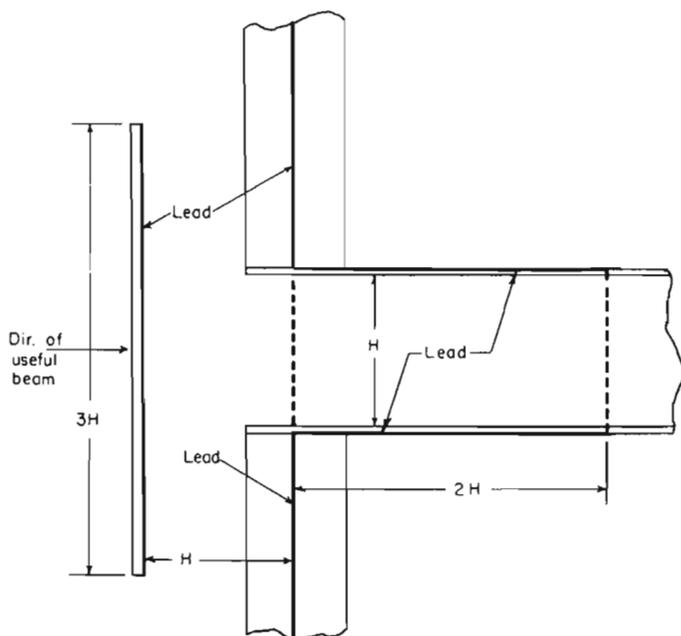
Typical baffle design for openings in primary protective barrier for orthovoltage installations.
